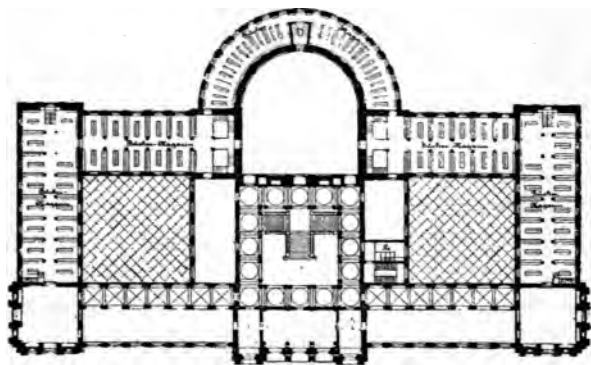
Ground floor plan of the University Library, Leipzig.
